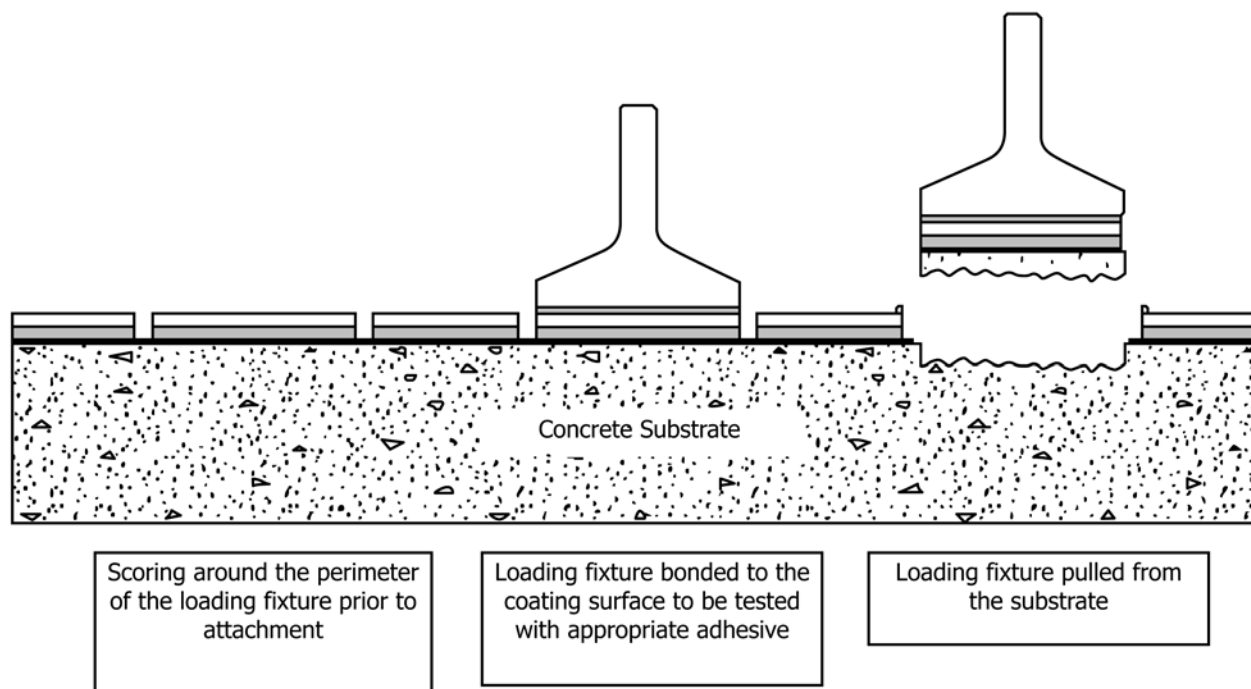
Scoring Around the Loading Fixture Prior to Attachment of the Fixture (Round Loading Fixtures)
